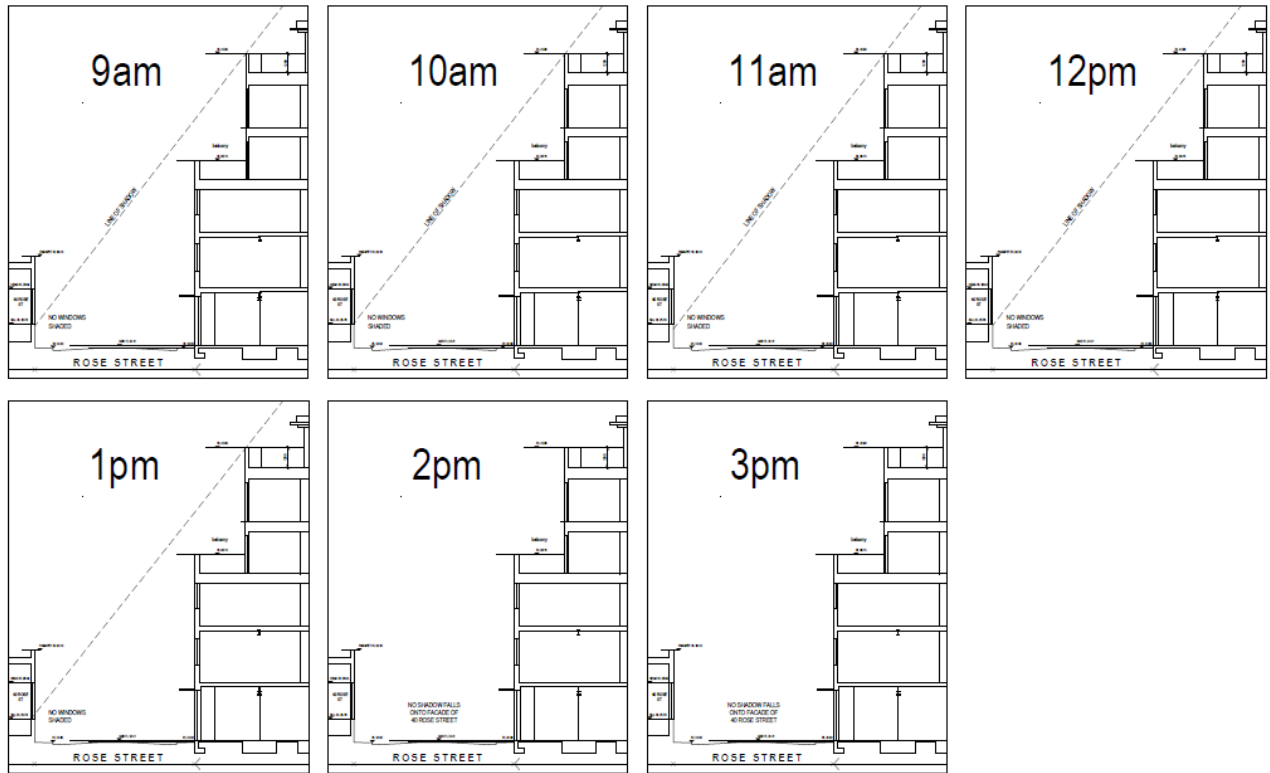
Shadows cast over the balcony area associated with the western adjoining dwelling at the equinox (September 22nd)
